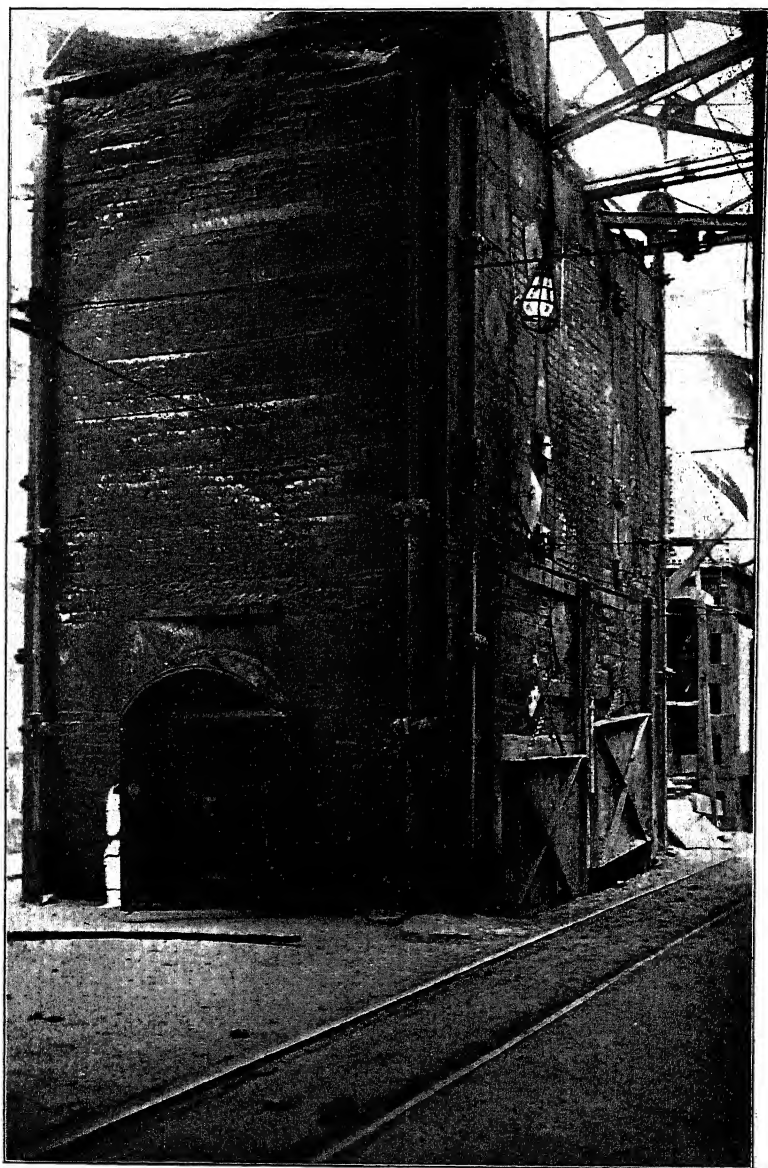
No. 3 FURNACE. THE OLD STYLE OF TOP, REINFORCED BRICK WALLS.
